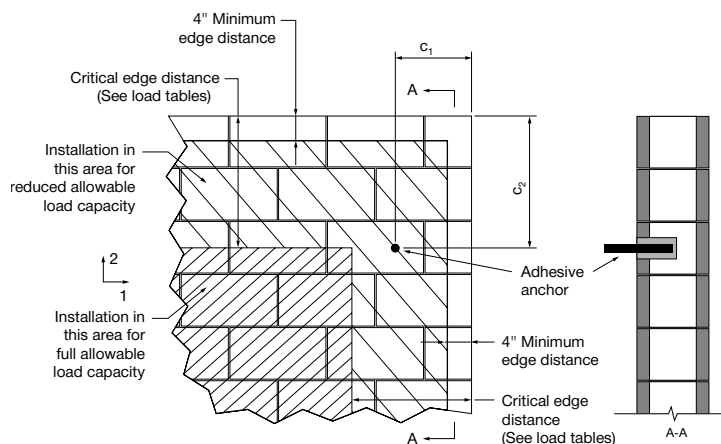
Allowable anchor installation locations in the face of grout-filled concrete block
